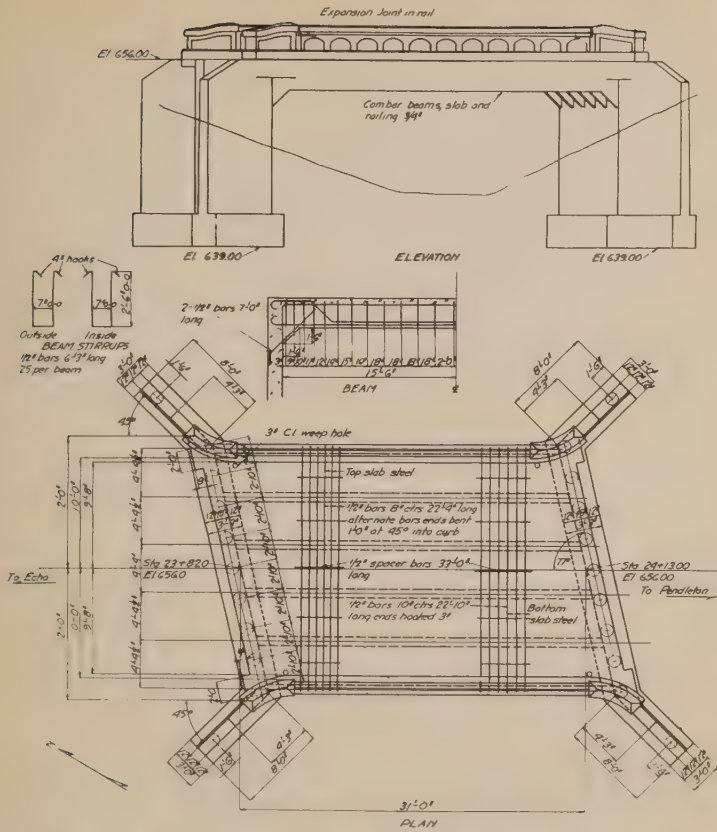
Typical R. C. multiple beam design, short wing abutments.
